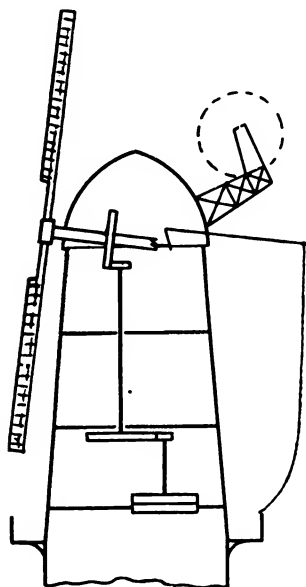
Gearing for Mill with Single Pair of Stones.
